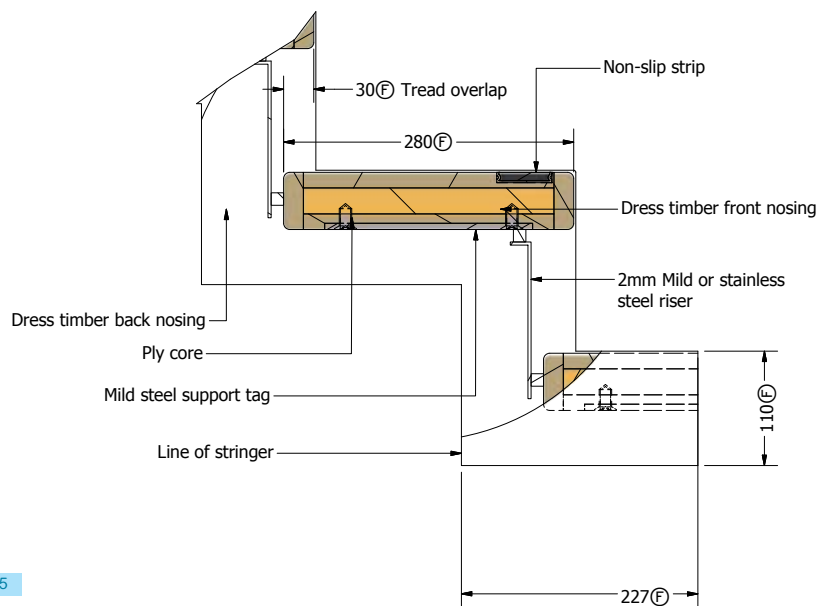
Typical tread and riser detail for Z1 stringer. Tags welded to the inside of each stringer support screw fixings to composite treads with anti-skid tread nosings. In commercial applications, some risers in the interests of modesty may be appropriate, and here a folded metal riser is shown.
